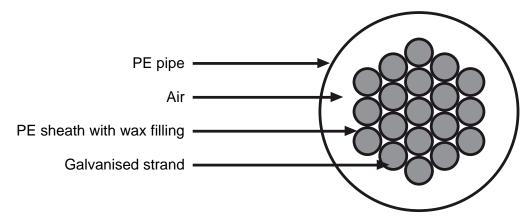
ILLUSTRATION OF NEW CABLE SYSTEM WITH MULTI-LAYER PROTECTION
